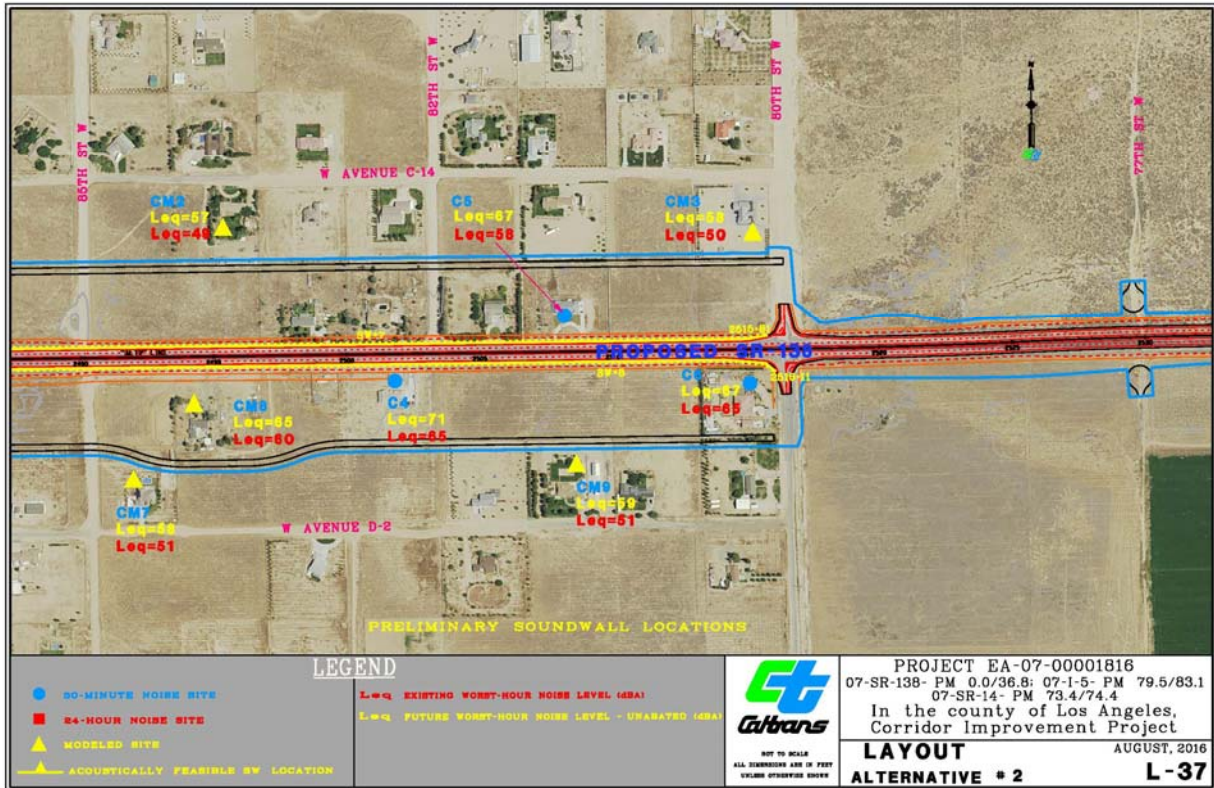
Alternative 2 (Roundabout) Soundwall Location – 7 and 8 (sheet 1 of 2)
